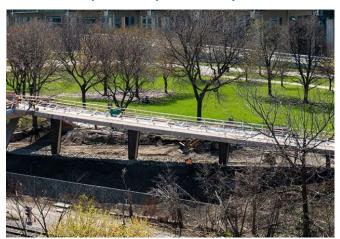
Example 1: Ramp Elevated by Concrete Solid Slab
